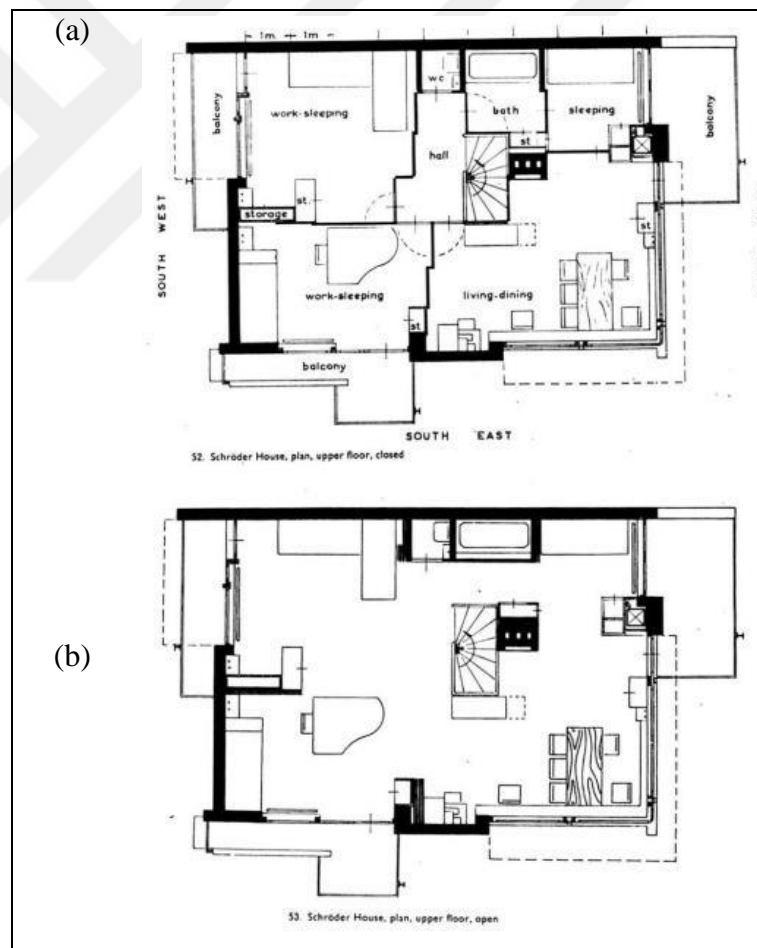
Upper floor plan of Rietveld-Schröder House (a) Wall panels' closed form, (b) open form [47].
